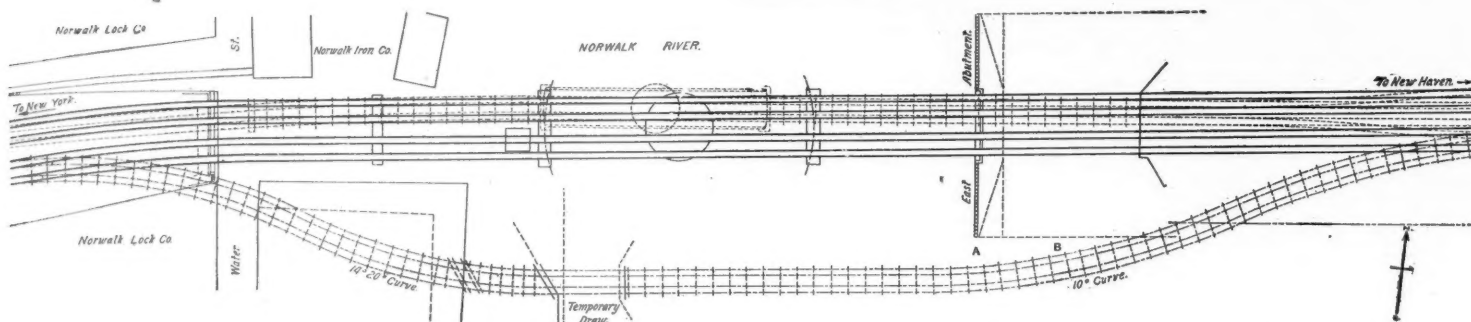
Plan of New, Old and Temporary Tracks—Norwalk Bridge.
